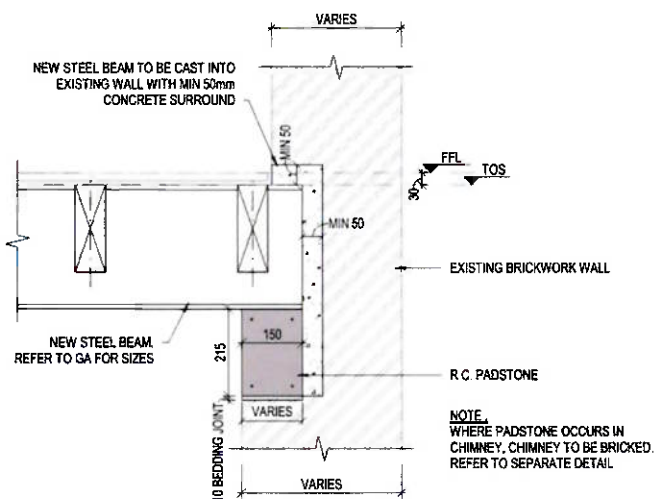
Typical Padstone Detail for Steel to Masonry Wall
